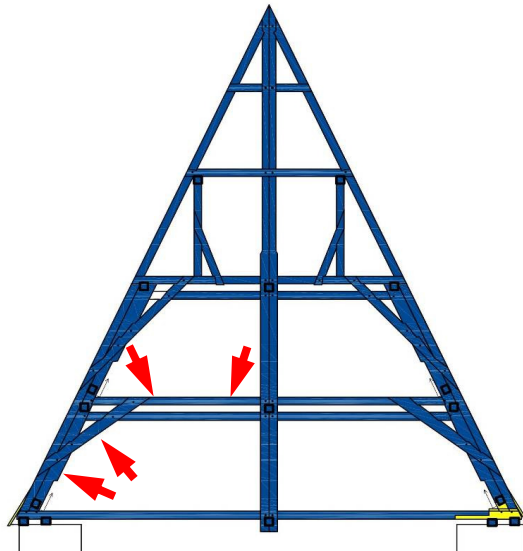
A schematic view of the structural system of the roof construction and location of the measurement points
